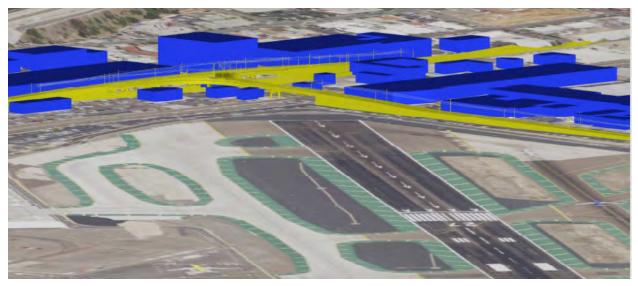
Airport Trolley Connection to Laurel Street Trolley Bridge – Conceptual Layout
